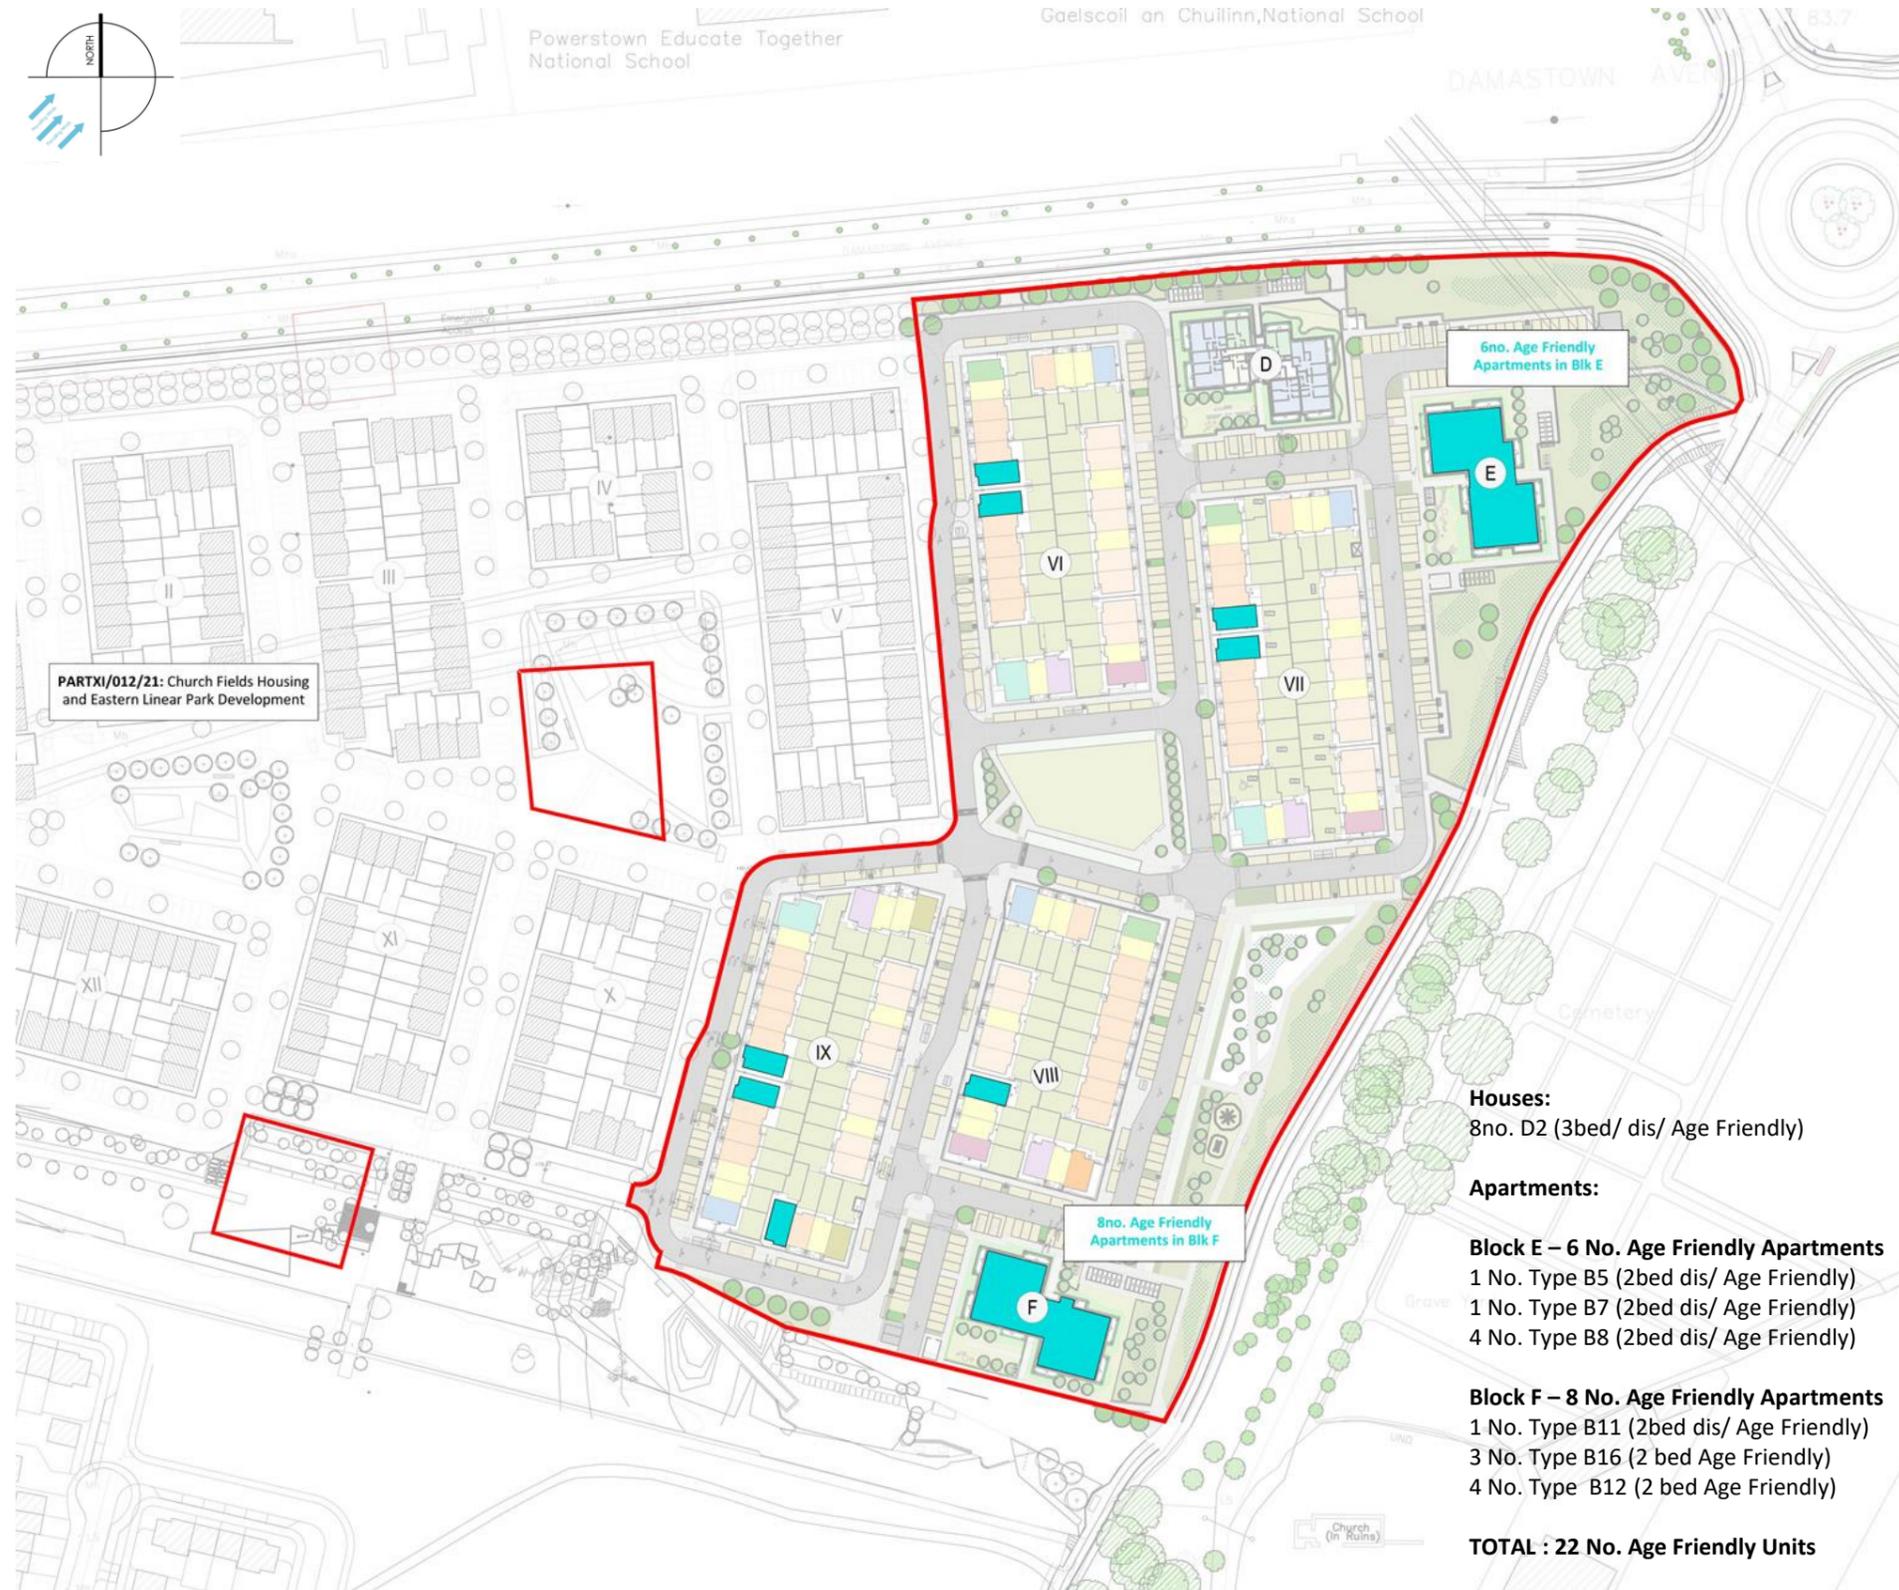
Proposed Site Plan – Designated Age-Friendly Units
